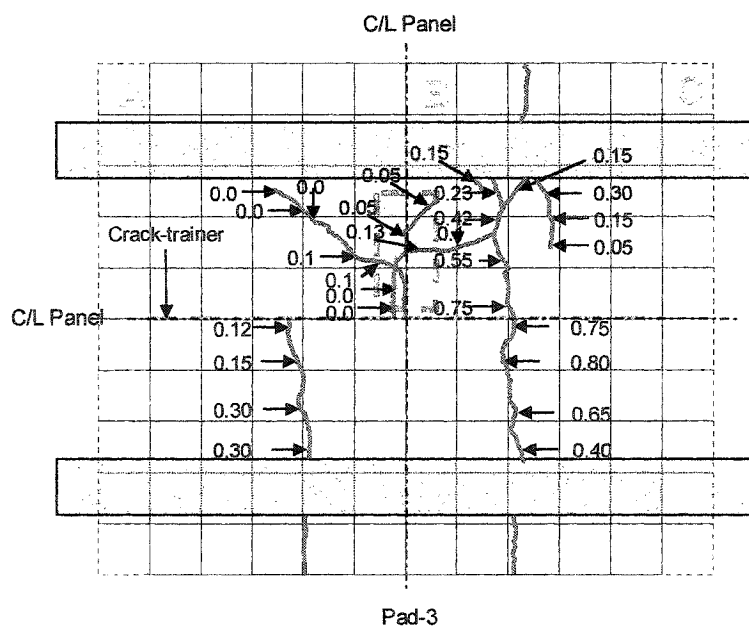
Panel-B: Crack Pattern on Soffit after 1,700 Load Cycles
